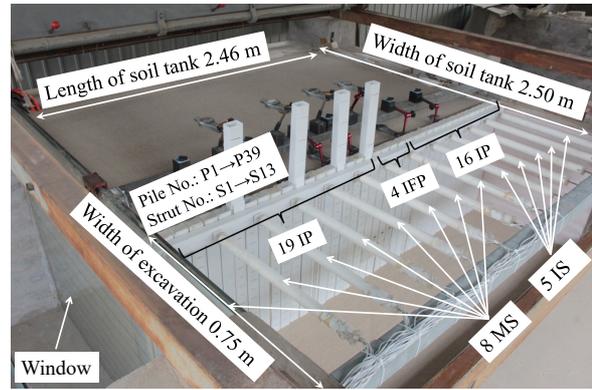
Platform of large-scale model tests and excavation model (Zheng et al. 2020a).
